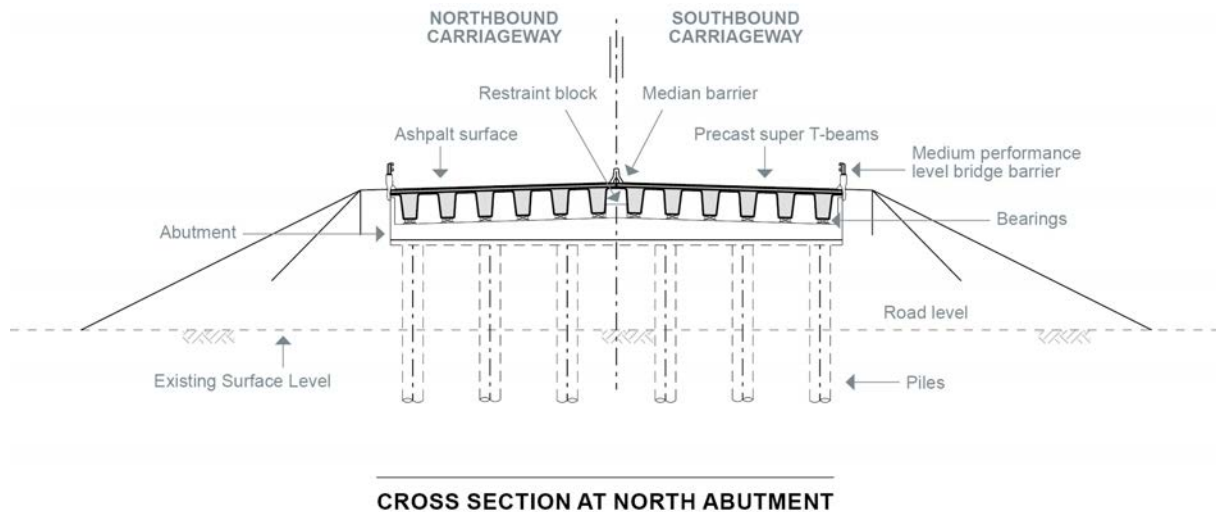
Schematic diagram of proposed bridge structure spanning arterial roads
